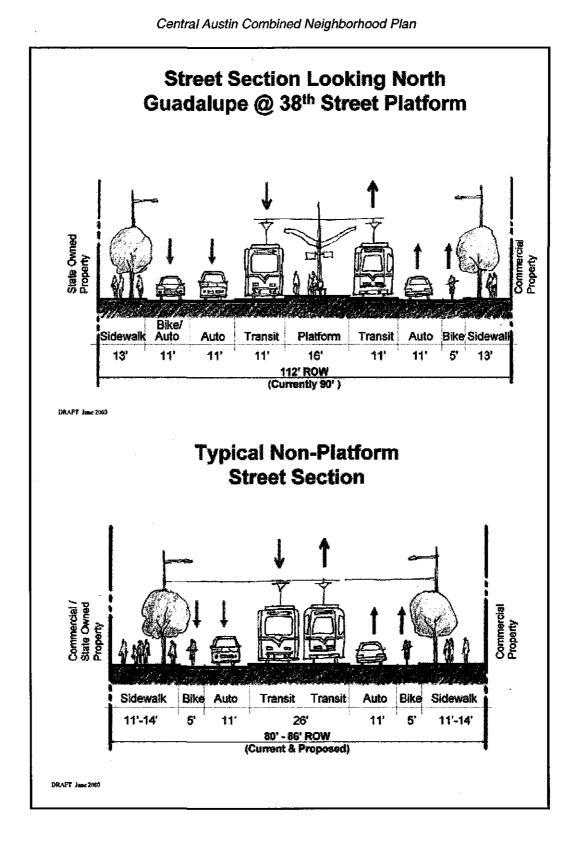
Guadalupe @ 38<sup>th</sup> Street Station Sections
